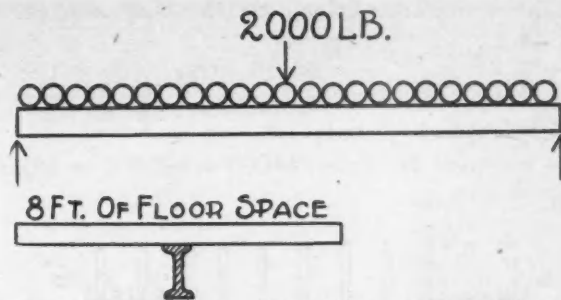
Side View of Beam and End View of I-Beam with Section of Floor to Be Carried.
